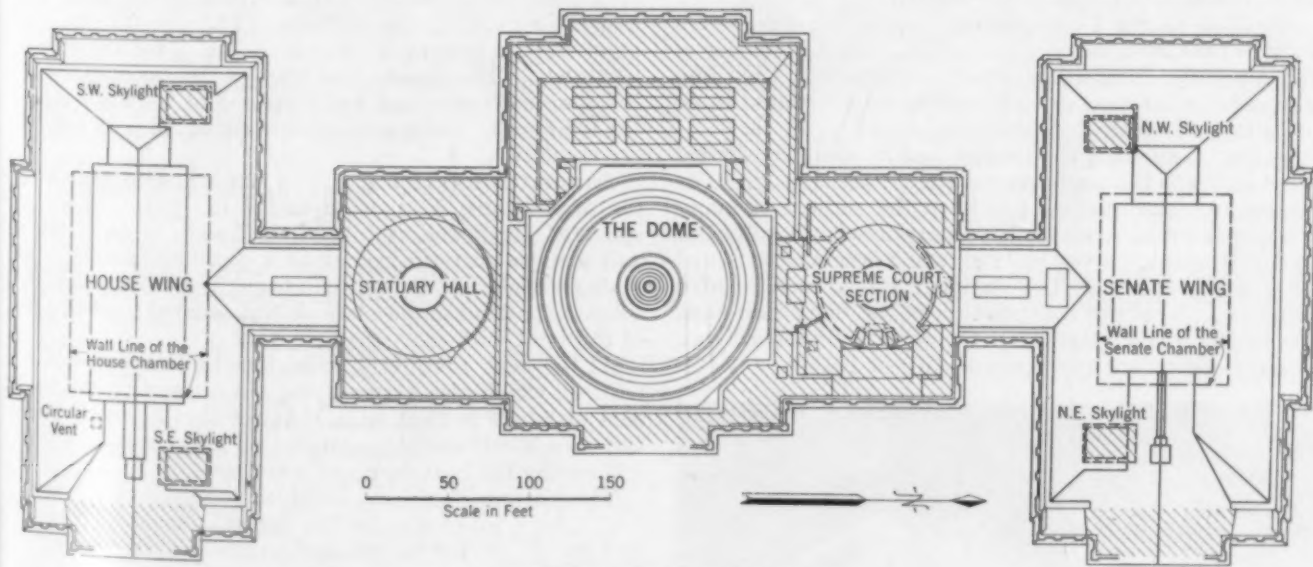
KEY PLAN OF ROOF, U.S. CAPITOL
